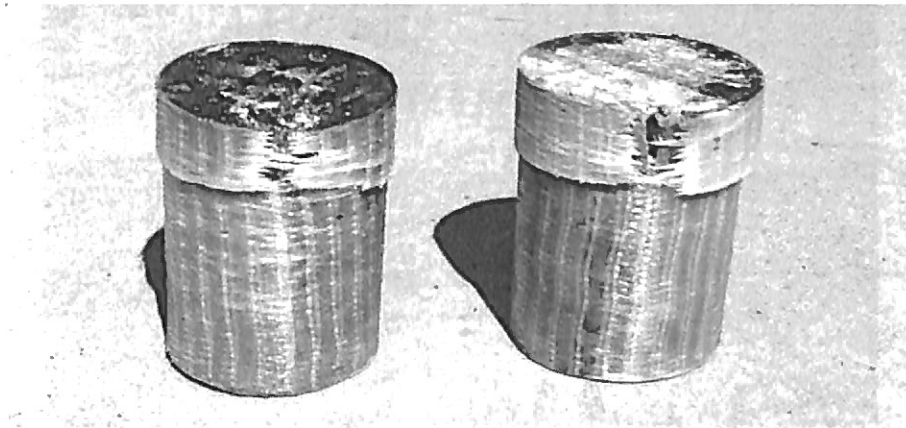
Compression Failure of Laboratory Fabricated Cylinders with Transverse Fiberglass Reinforcement
